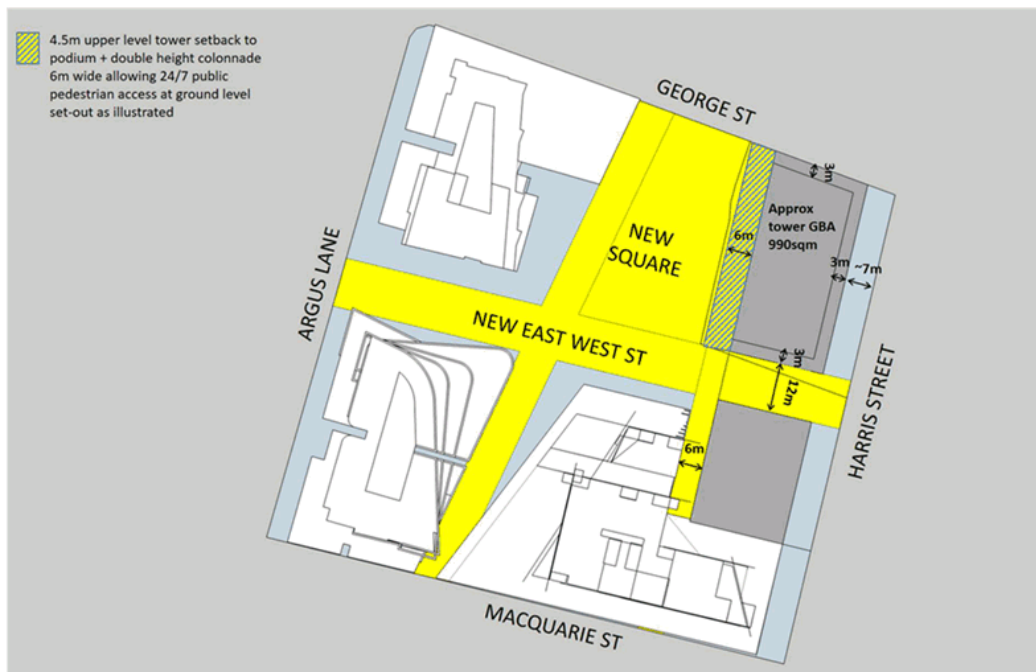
Control diagram: Height of Building in Storeys and Setbacks to towers over podium on former Albion Hotel Site
